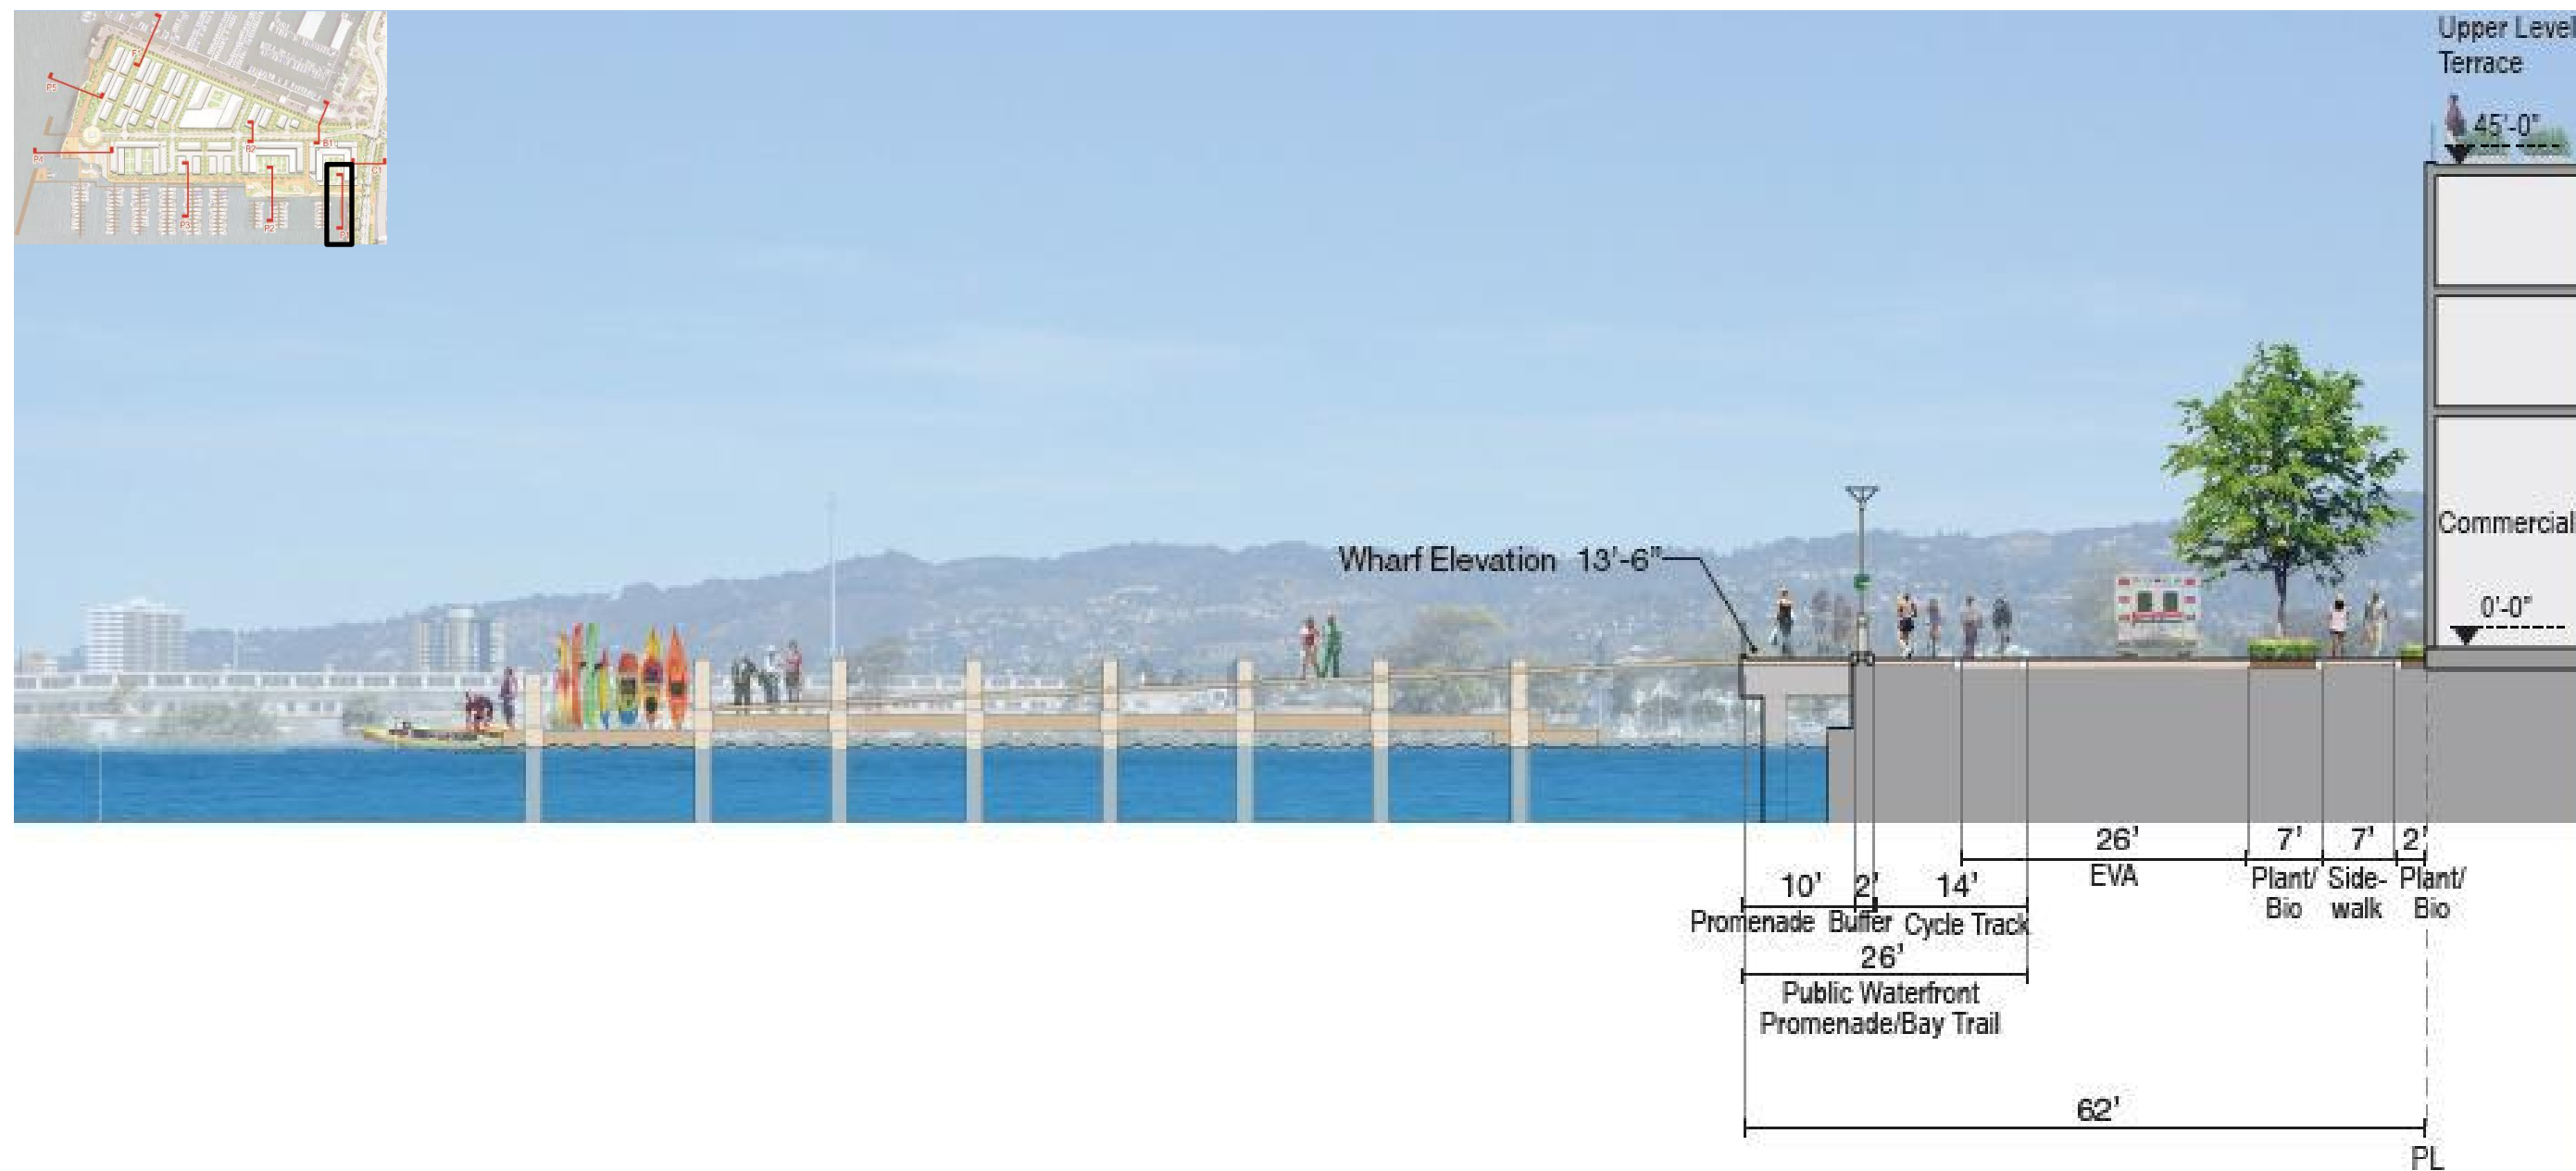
Illustrative Cross Section P1: Clement Plaza, Waterfront Promenade and Bay Trail adjacent to Gateway District (view looking north)
